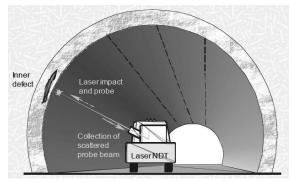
Schematic of the hammer-like laser remote inspection system [49]
